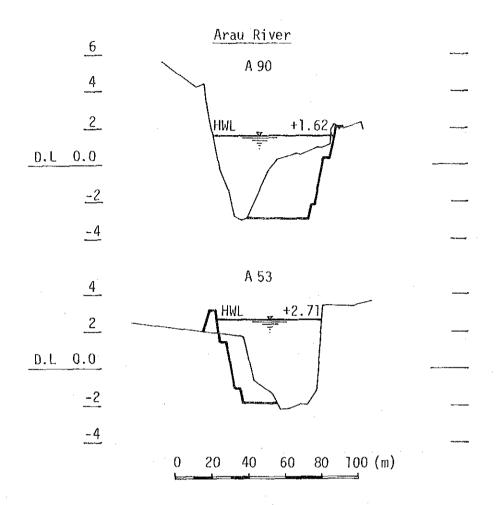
(1) Proposed Cross Section of the Arau River for Comprehensive Plan
